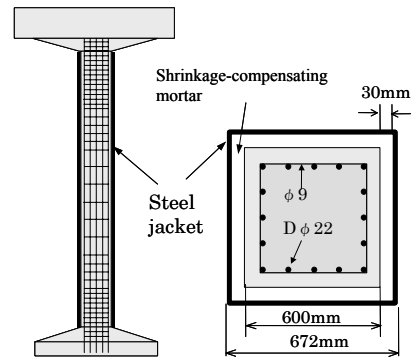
Arrangement of reinforcing bars and cross section of the jacketed column
